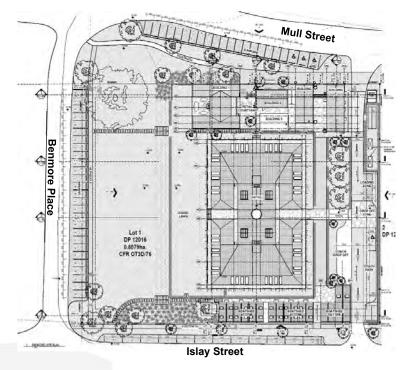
Proposed Site Layout (Extract from RTA Studio Drawing)
